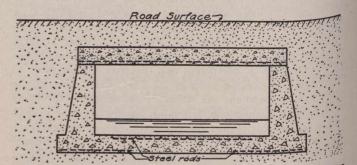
Reinforced Concrete Floor, for Distributing Pressure Over a Greater Area and for Protecting Foundation from Erosjon.
